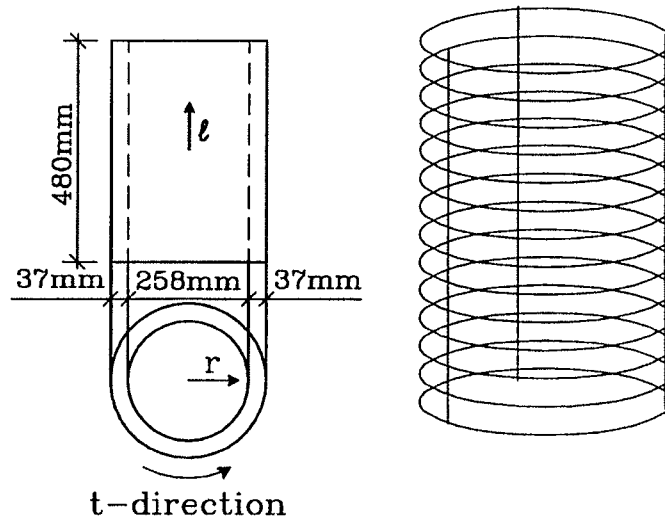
Schematic illustration of the specimen from [88,1]
